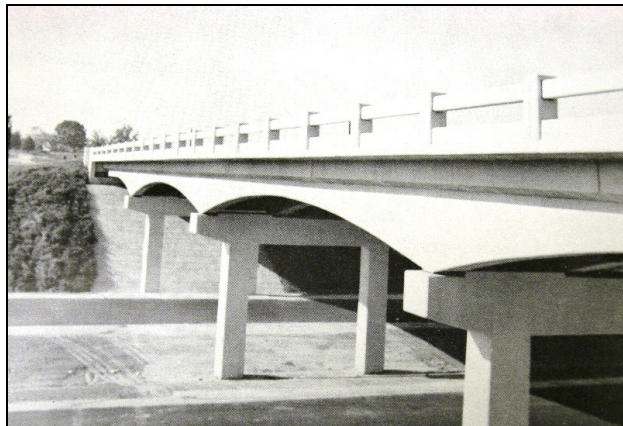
Typical continuous-design T beam bridge. SR 316 over I-85 in Gwinnett County. Source: SHD, Biennial Report (1958).
